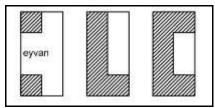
Plan types with I and L shape side sofa and U shape (Bektaş, 2008)
